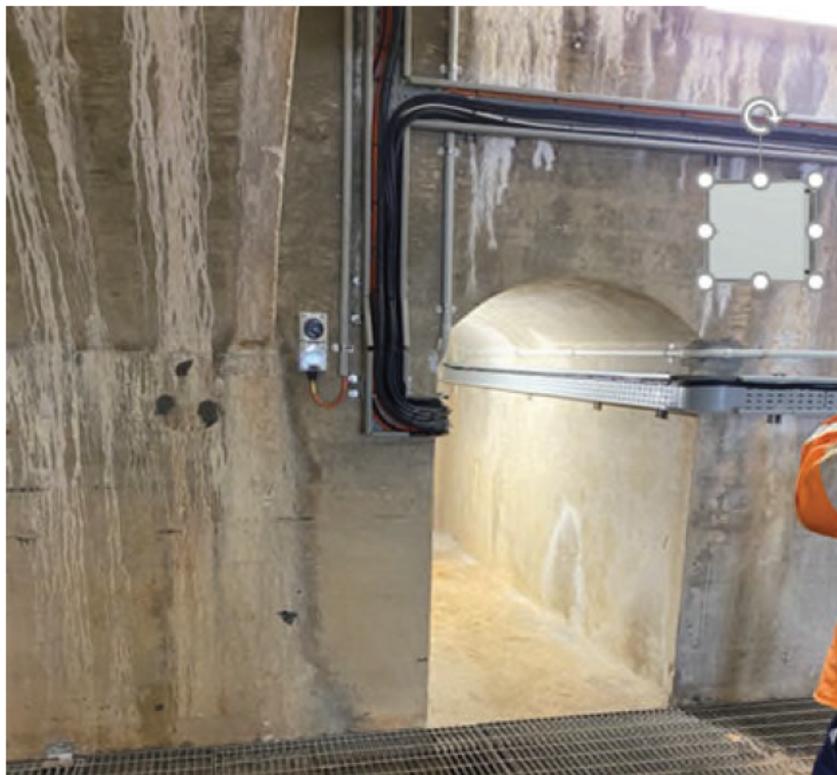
CCTV Panel will be mounted on the wall inside the dam gallery
